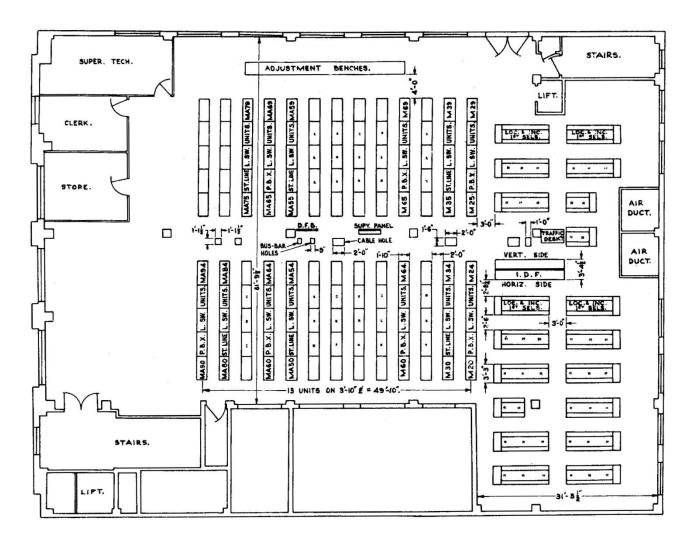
PRE-2000 TYPE LAYOUTS. DIMENSIONS
